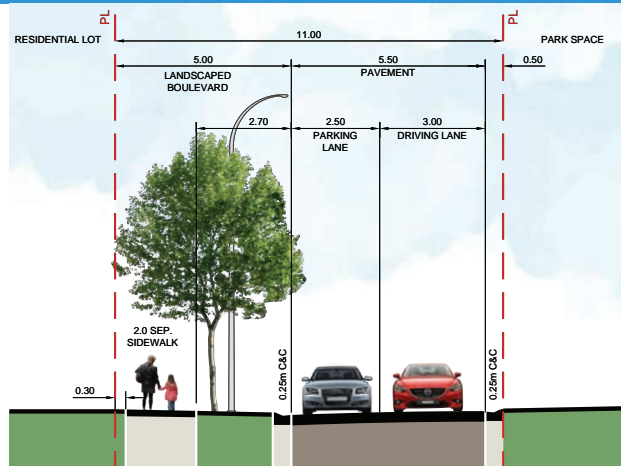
ROAD SECTION | STANDARD RESIDENTIAL ROAD – 16.0M
